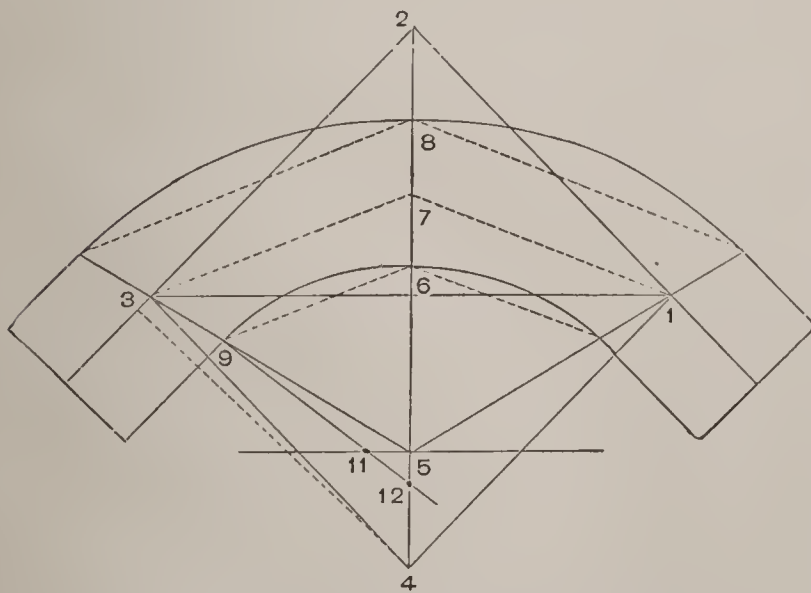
SHOWING MANNER OF DRAWING MOULD.
